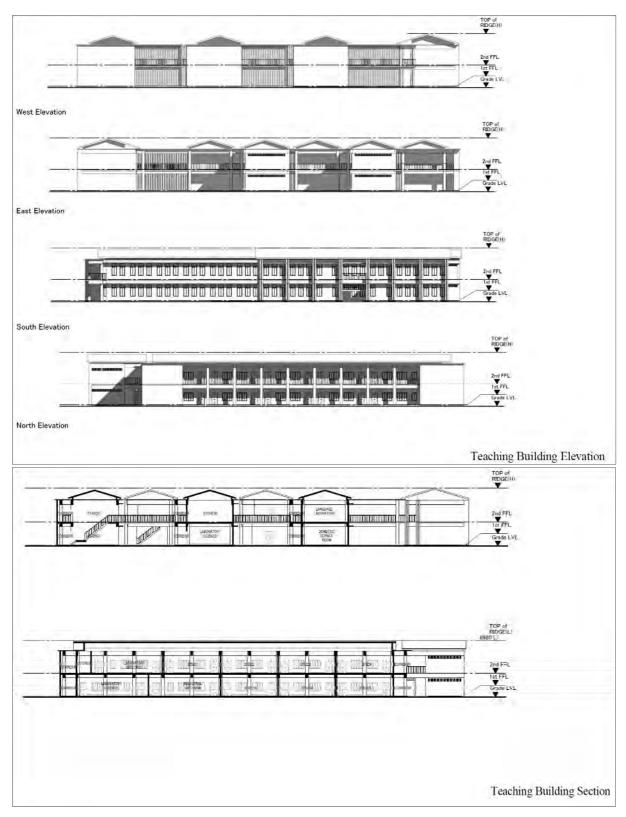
Plan of Teaching Building (Elevation & Section)
